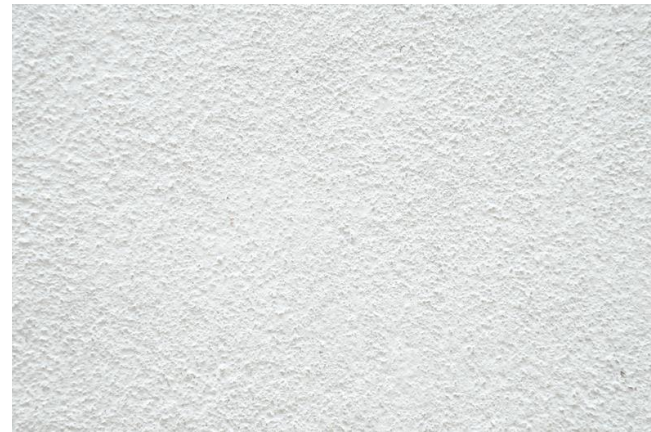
(a): Concrete wall (Riva, 2017)
